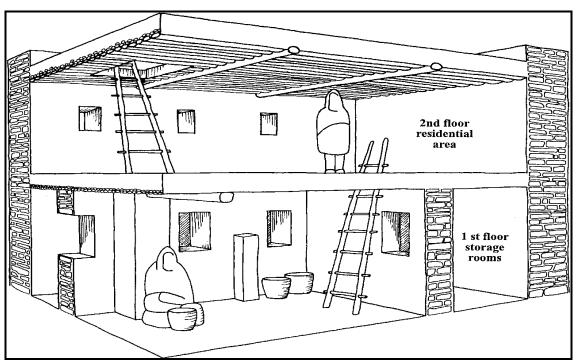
LPPNB; Architectural reconstruction of two-story building at Area B, Basta, Jordan (Kuijt, Goring-Morris 2002).
